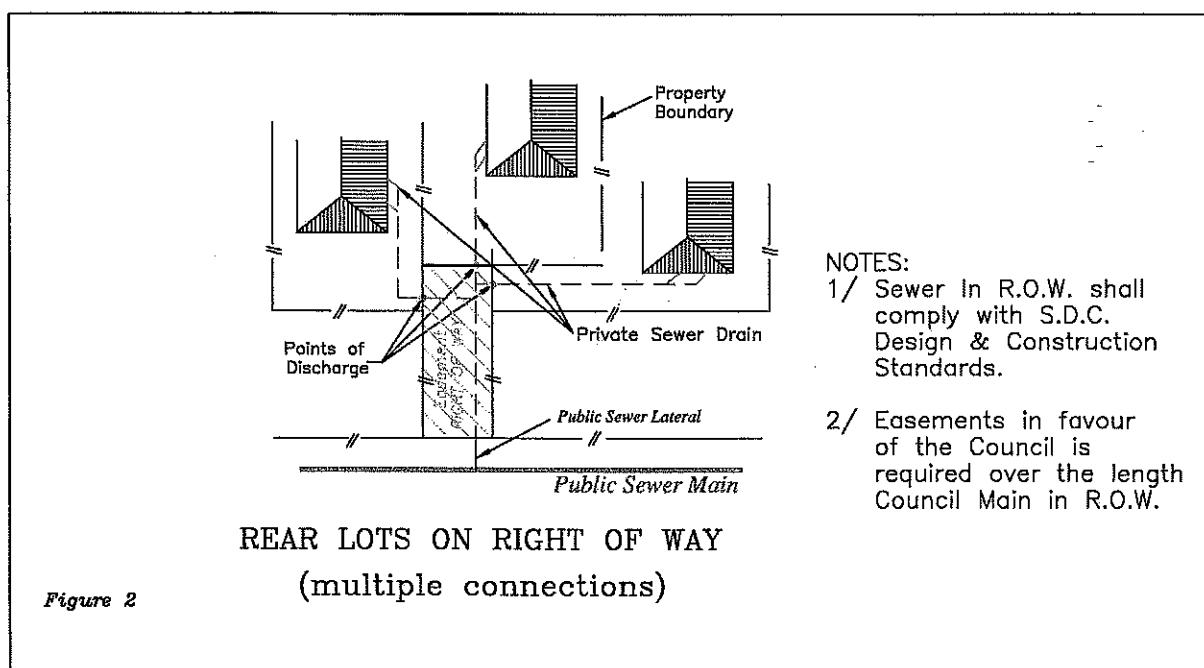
Typical layout at point of discharge – Individual customers multiple connections rear lots on Right of Way – Easement required.
